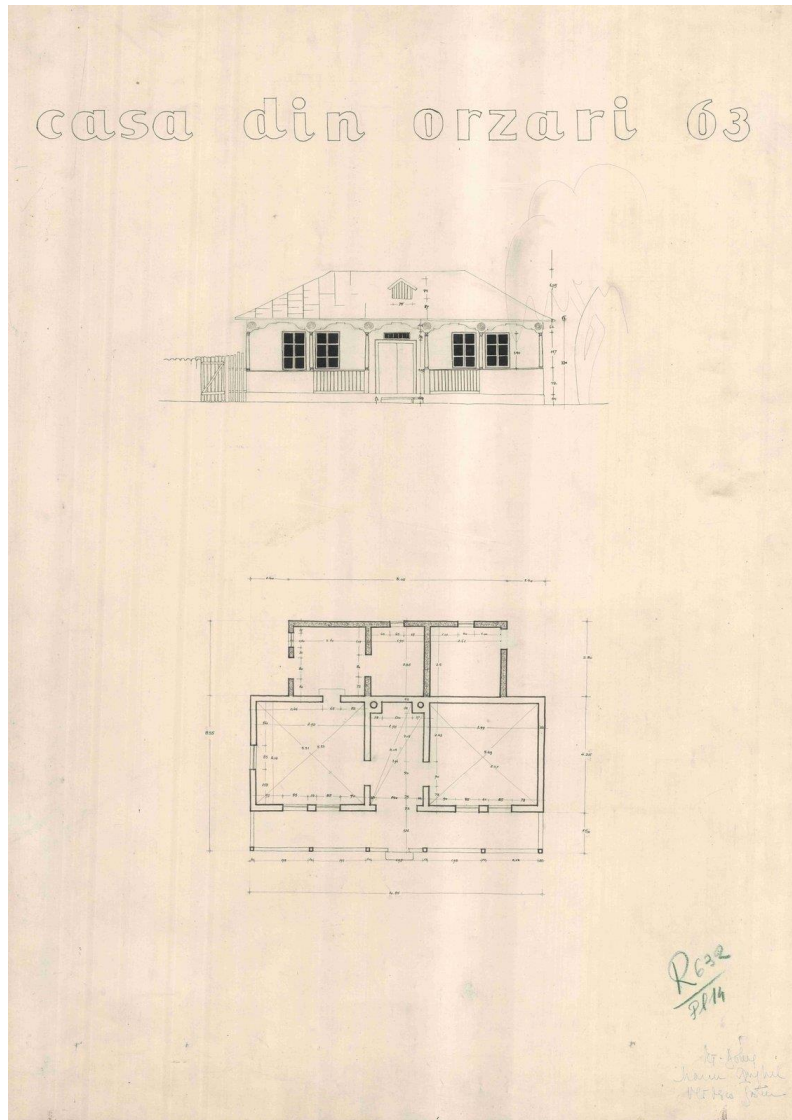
House from Orzari Street n° 63; image source: University of Architecture and Urbanism 'Ion Mincu' Bucharest, Department of History and Theory of Architecture and Heritage Conservation, Surveys Archive, Planşa Rv.470.16, Main facade, Plan for the ground floor.
